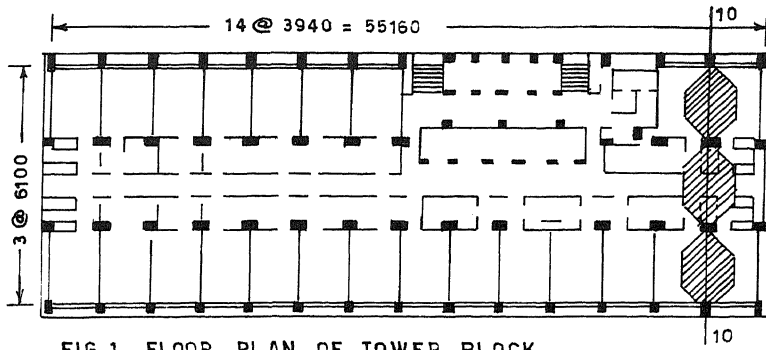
FLOOR PLAN OF TOWER BLOCK
